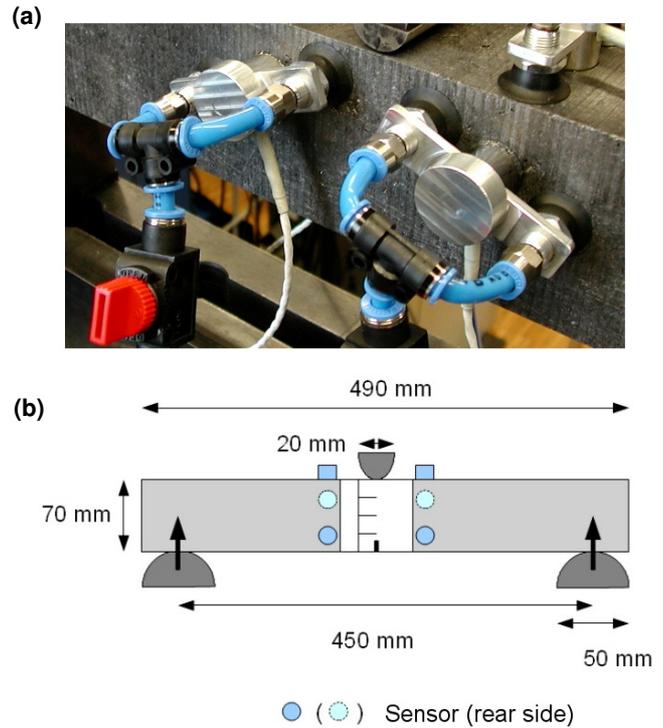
Vacuum punch to fix the sensors at the sample surface (a); schematic view of the experimental setup and the used sample size (b)
